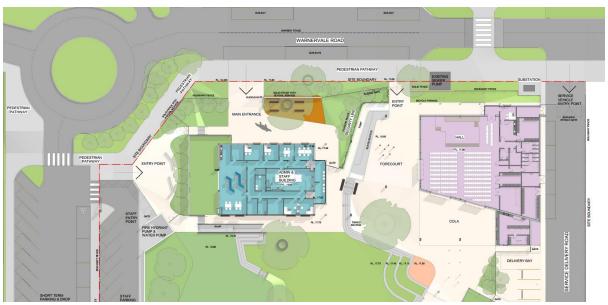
Floor plan extract showing the single storey buildings located adjacent to the Warnervale Road frontage.
